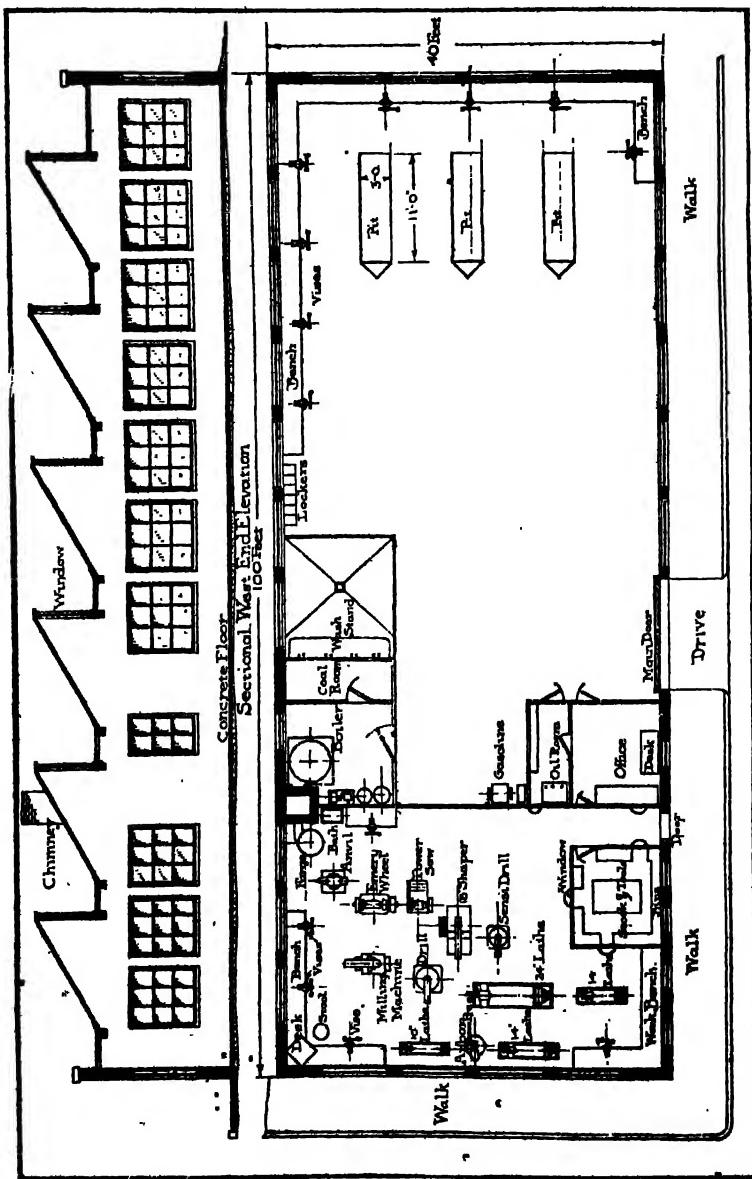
Elevation and Floor Plans of Medium Size Automobile Repair Shop.
